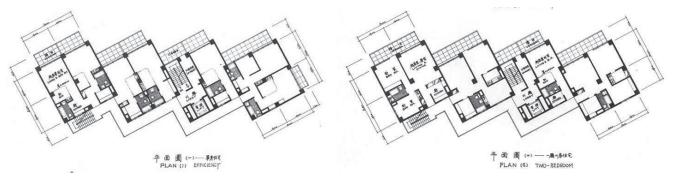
the plan of house with single-bed room in the left, yet could be combined into a household with two-bed room as the right plan. © Xiu, 1968.
